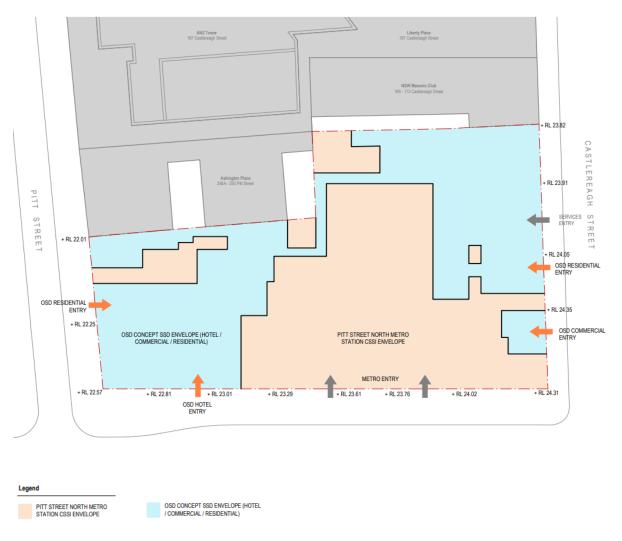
Envelope drawings, identifying the allocation of substantial space to Pitt Street Station uses
